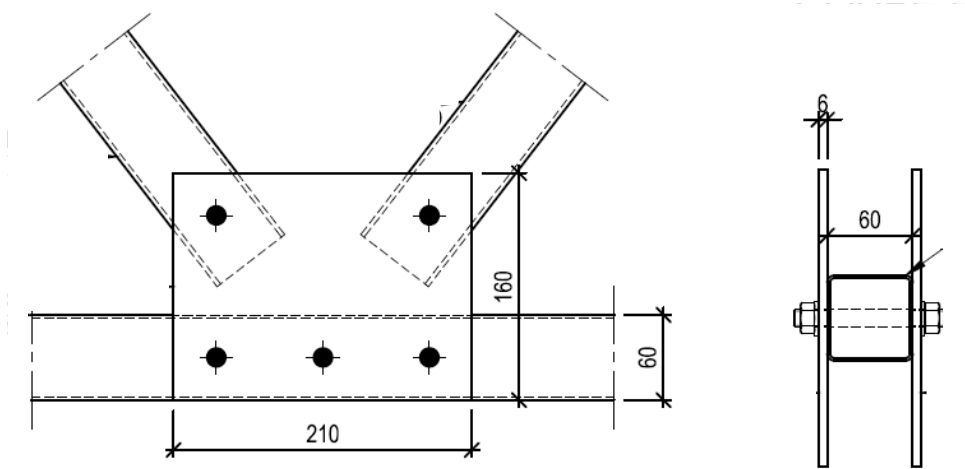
Example of a typical configuration of a joint with tubular elements, gusset plates and long bolts
